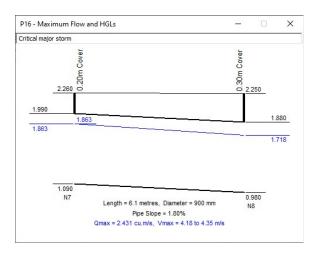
Pipe longitudinal sections and hydraulic grades (1% AEP)
